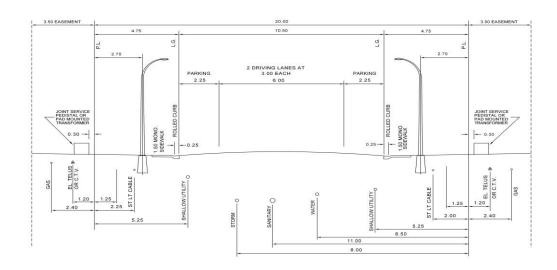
Typical Hamlet Collector Road Cross Section – N.T.S.
